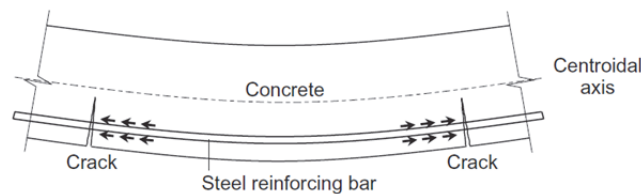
Tension Stiffening with Stress through Bond (Ng, Lam, & Kwan, 2010) Used under fair use, 2013
